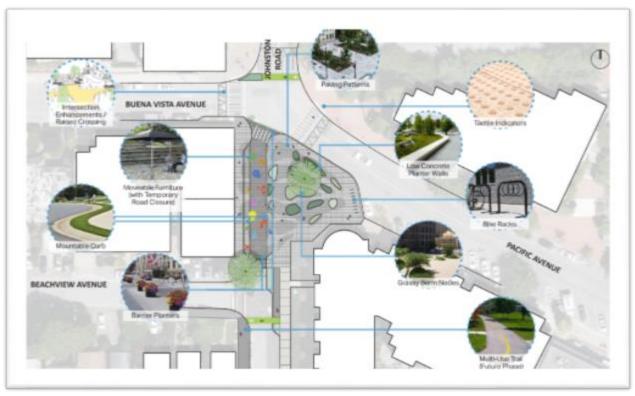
Alternative Concept with temporary Barrier Planters in place (can be implemented on an as needed basis)
